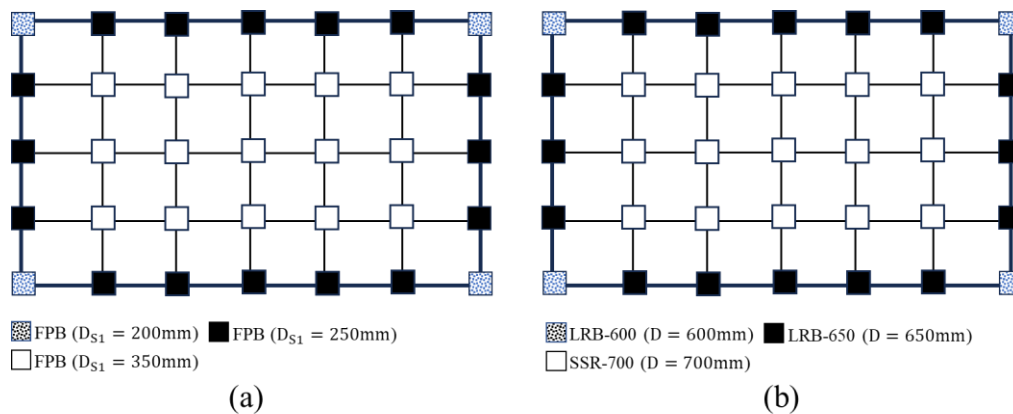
Layout of isolation layers with: (a) sliding bearings; (b) rubber bearings.
